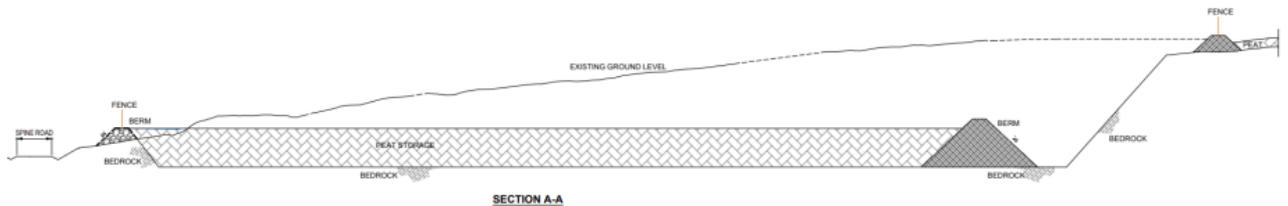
Cross Section of Borrow Pit South of Turbine 12
